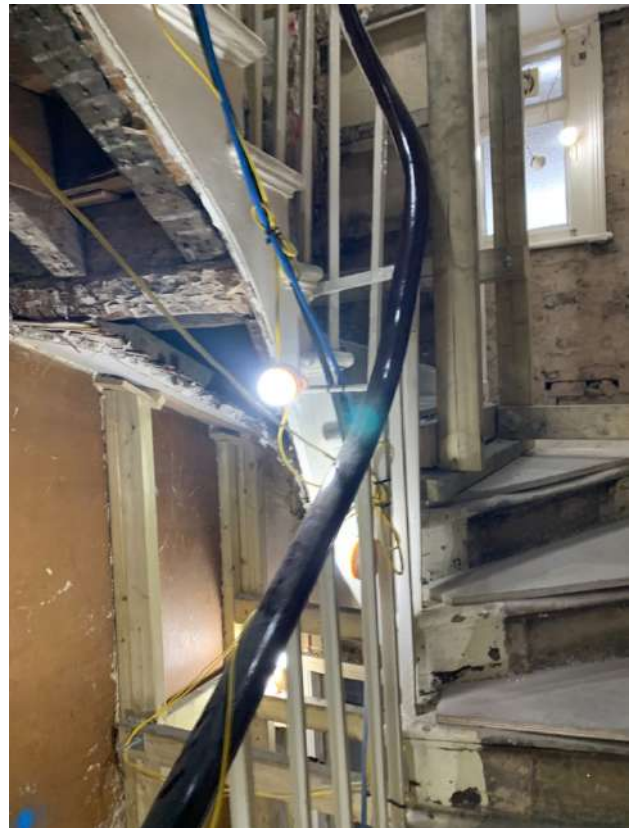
Existing 48 Stair view of door frame for old servants door on third floor flight.
